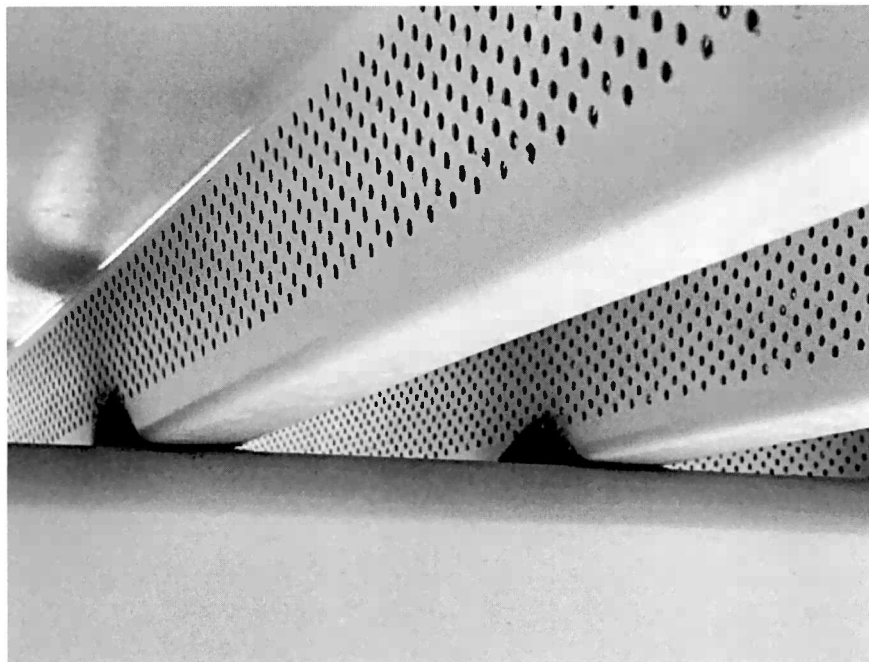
Damaged roof deck bearing at westernmost truss
